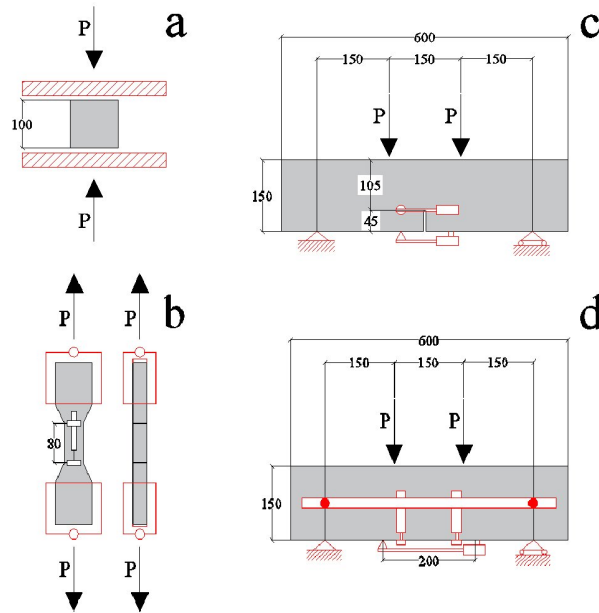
a) Compression test on cubic specimen; b) Direct tensile test on dog-bone specimen; c) Four-point bending test on notched beam specimen; d) Four-point bending test on un-notched beam specimen.
